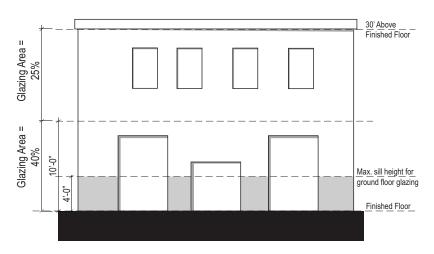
Commercial or Mixed Use building meeting glazing requirements.
